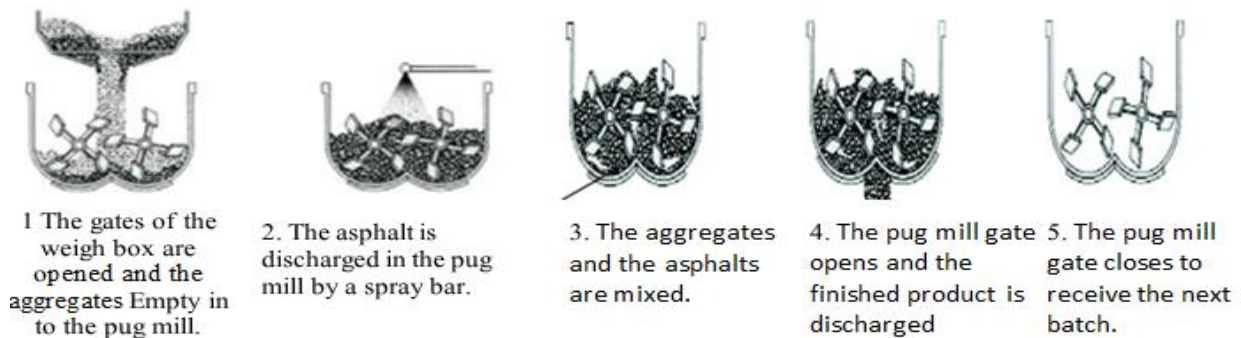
Steps in Typical Batch Plant Mixing Cycle.
